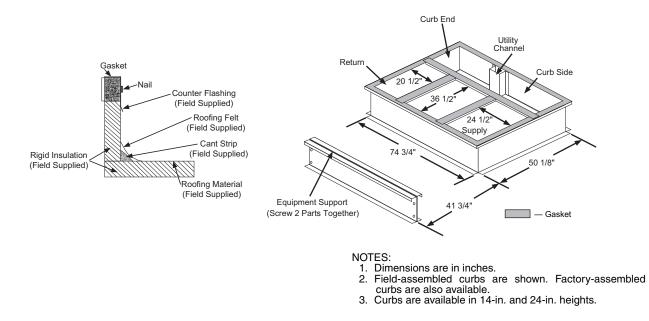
Accessory Dimensions — 62RA,RB,RC,RD07-20 Roof Curb
